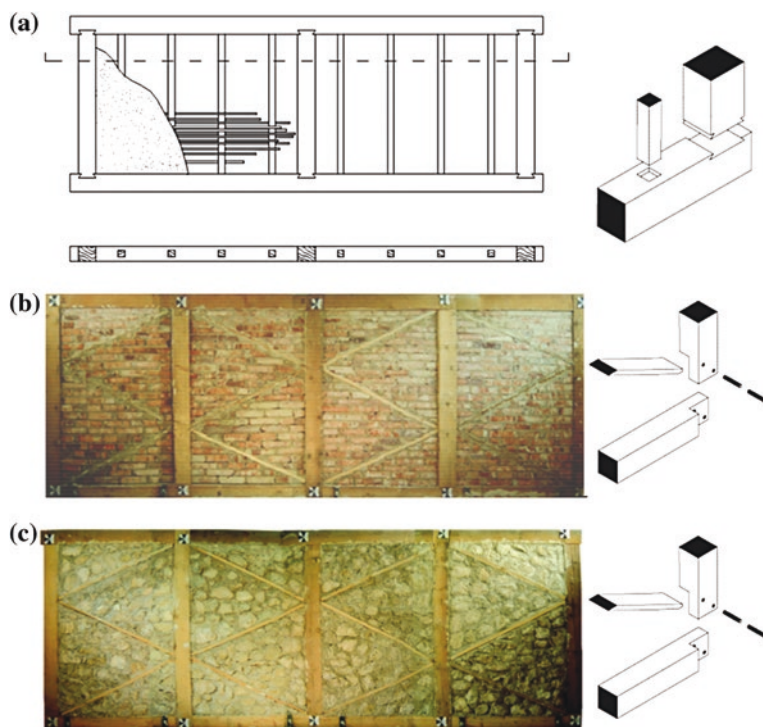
Traditional timber frame panels and joinery, a hazelnut branches infill and mortar, b brick infill, c stone infill
